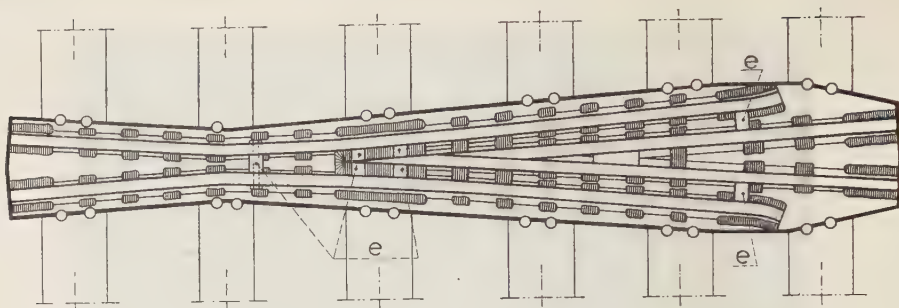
Layout of a welded acute crossing (*French Nord Railway*).
